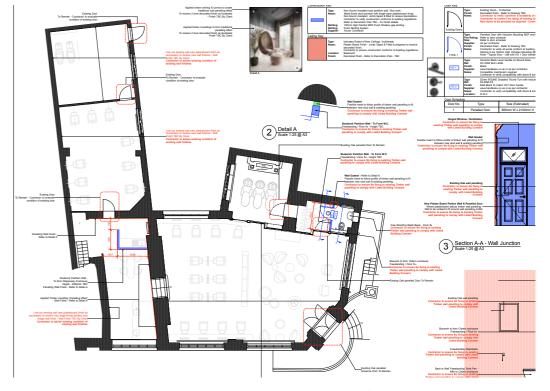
2004 Proposed ground floor plan, Planning Ref. 2022/3002/L
